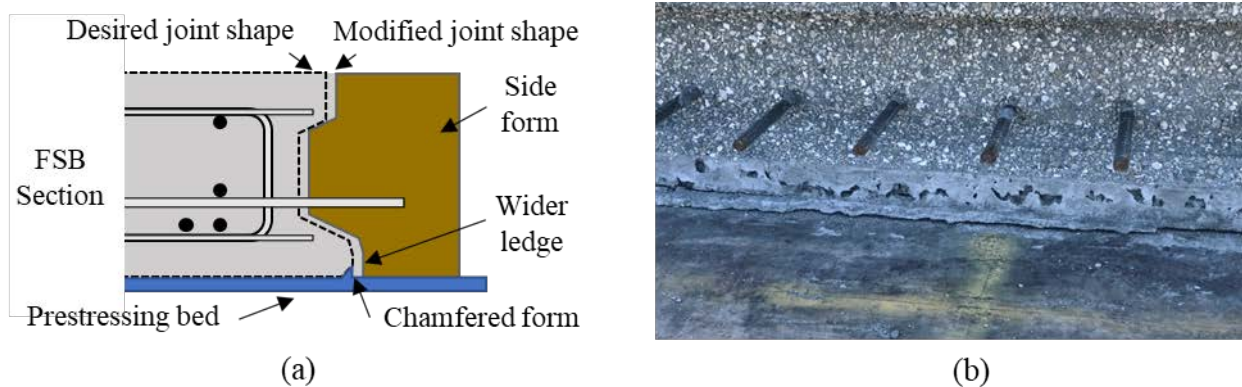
Joint construction issue: (a) side form misalignment with chamfered form and (b) bottom ledge geometry after side form removal
